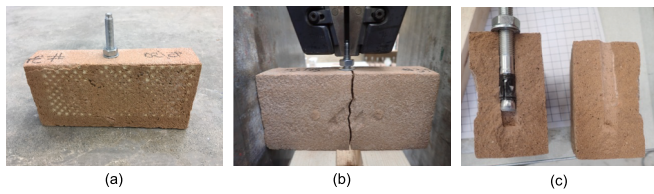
Example of specimen prepared for testing pull-out and shear strength of mechanical anchors in masonry: sample before (a) and after testing (b); specimen opened along its crack after removal from test setup (c).
